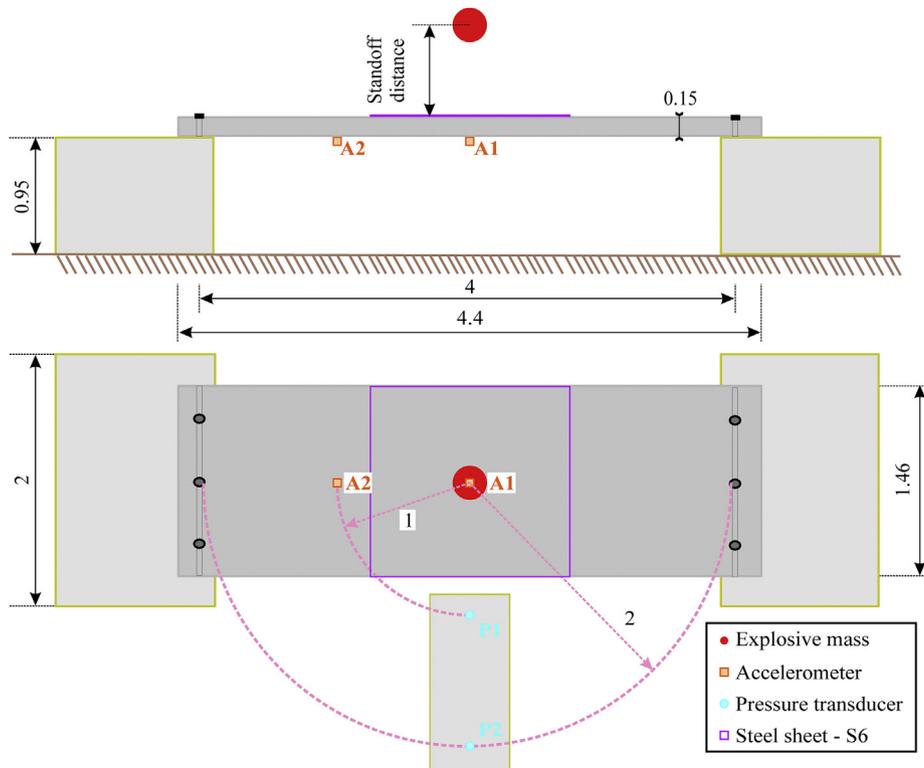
General blast test set-up. Measurement devices locations in slabs S1, S2 and S3, and steel sheet used in slab S6 (units: m).
